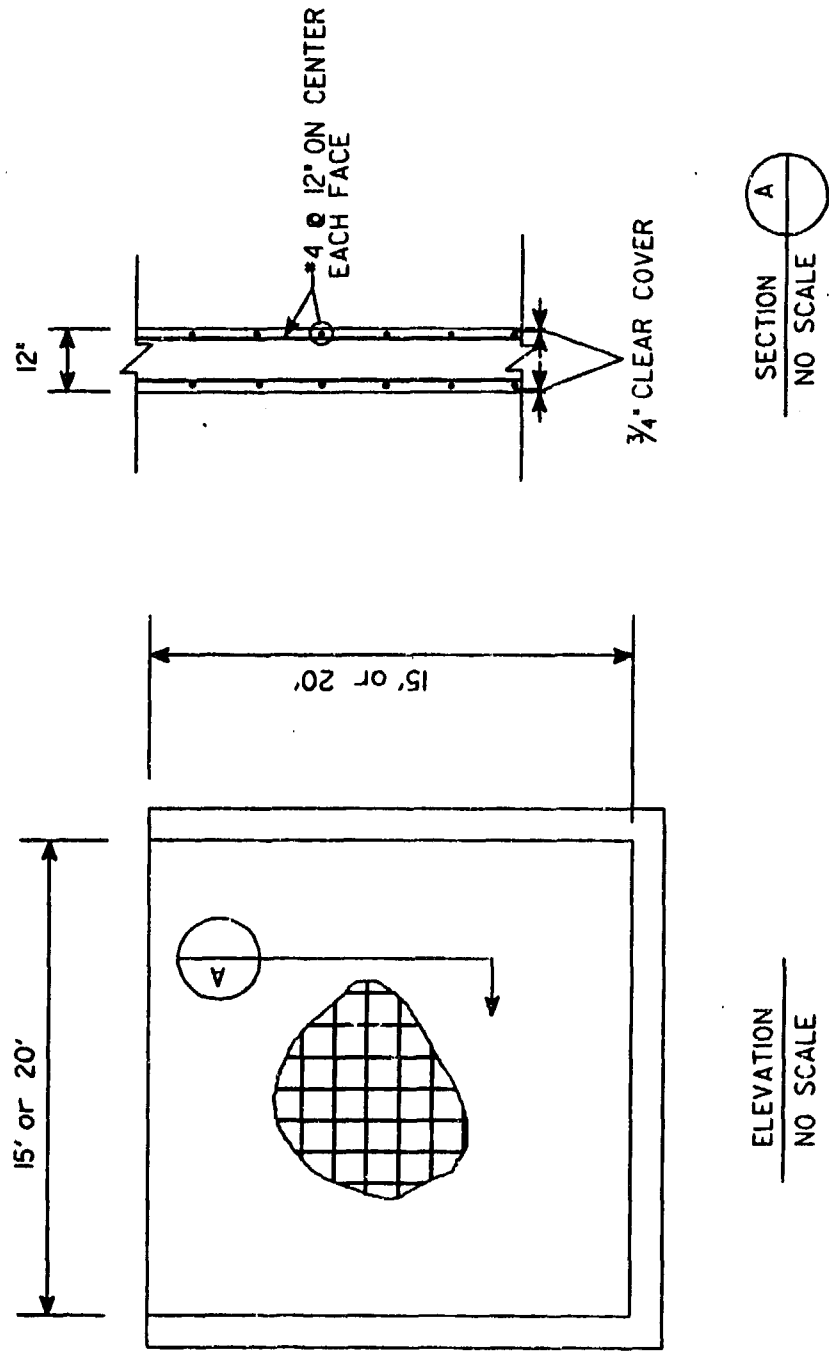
Typical 12" Reinforced Concrete Dividing Wall
